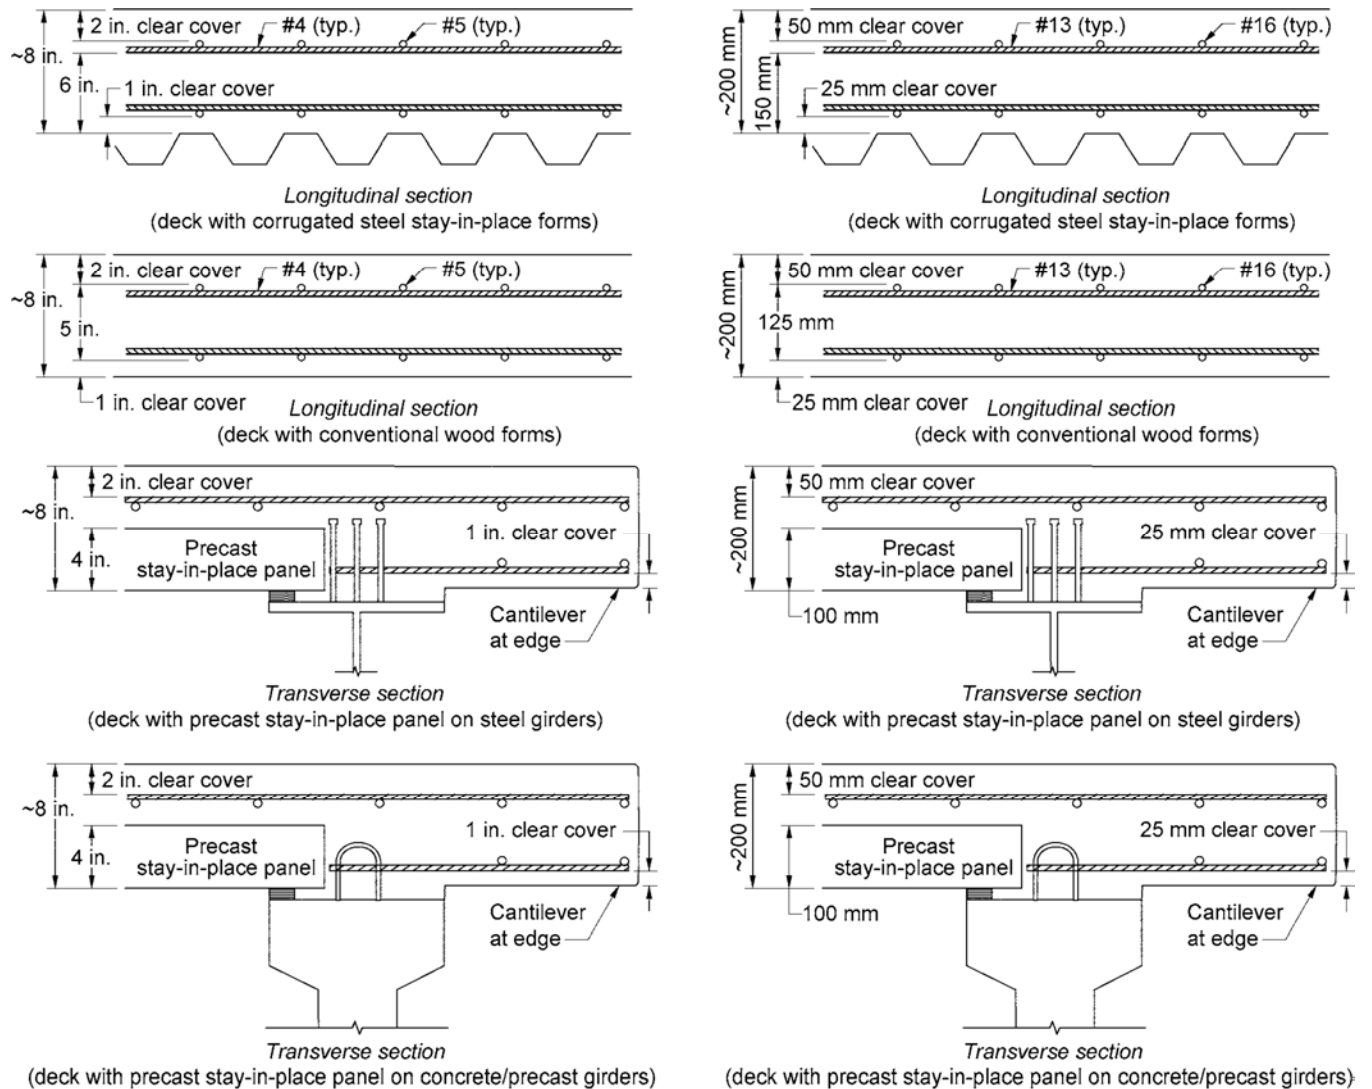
Sections of several common reinforced concrete bridge configurations—U.S. Customary units (left) and SI units (right).
